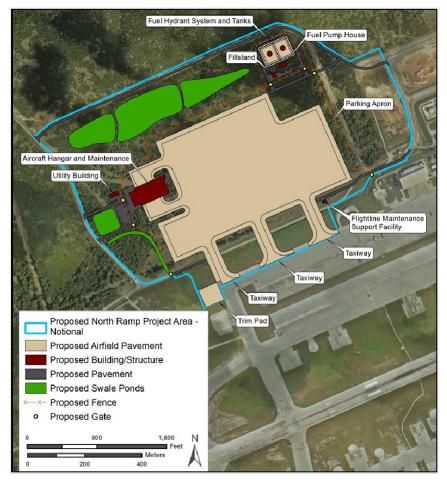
Proposed North Ramp infrastructure upgrades construction footprint.
